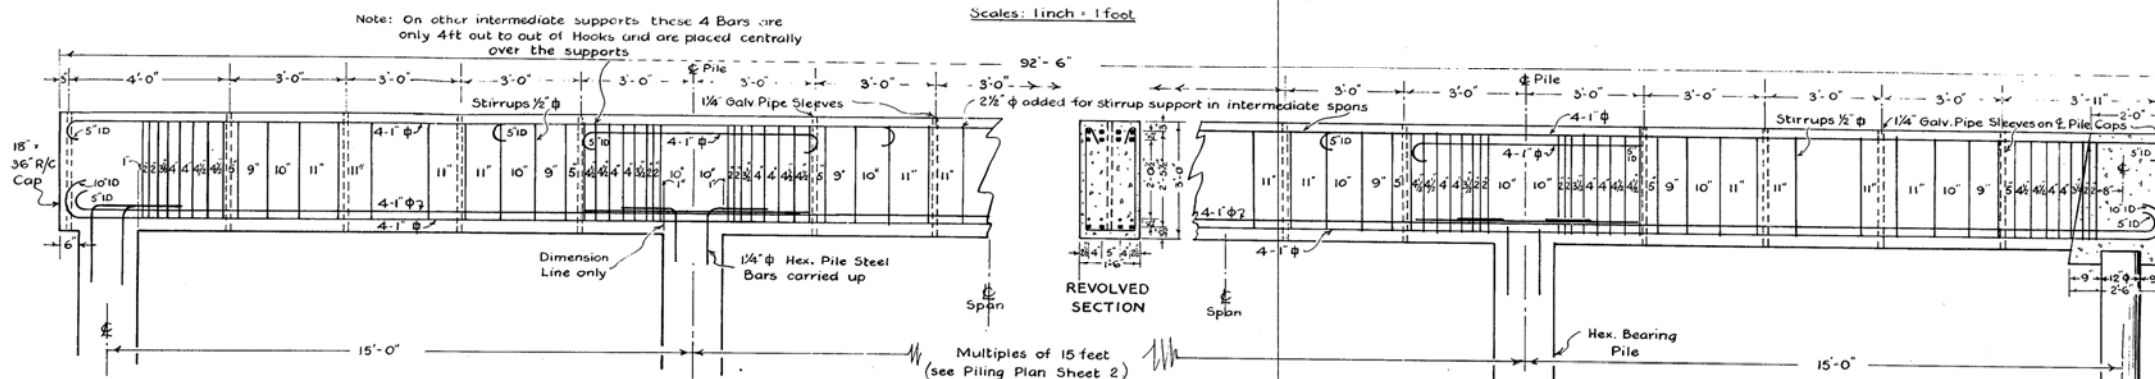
PILE CAP REINFORCING & ANCHORAGE - UNIT 2
